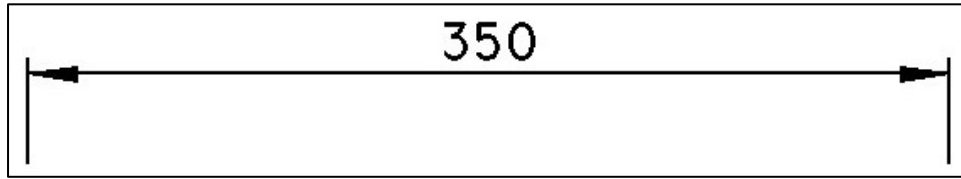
Dimension in millimeters. Always shown as a whole number
